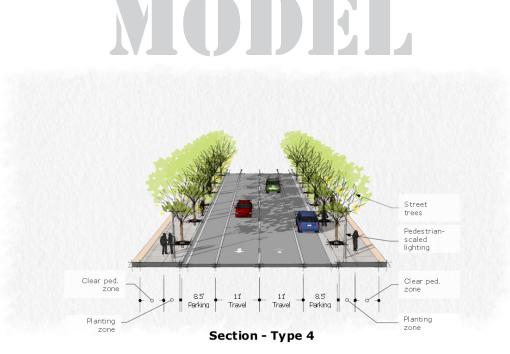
Configuration and dimensional requirements for street section Type 4 areas identified in the Street Section Plan.
